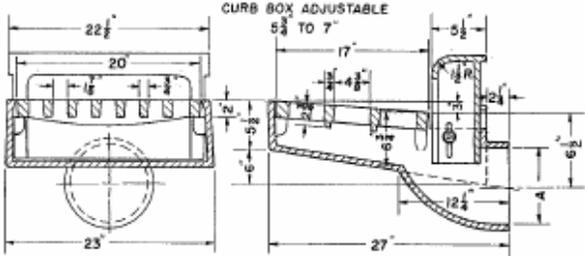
DETAIL FOR ADJUSTING CURBING TO MATCH CURB INLET FRAME
